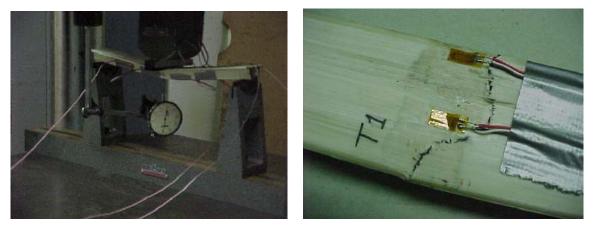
Trapezoidal Section Bending Test Set-up and Failure Mode
